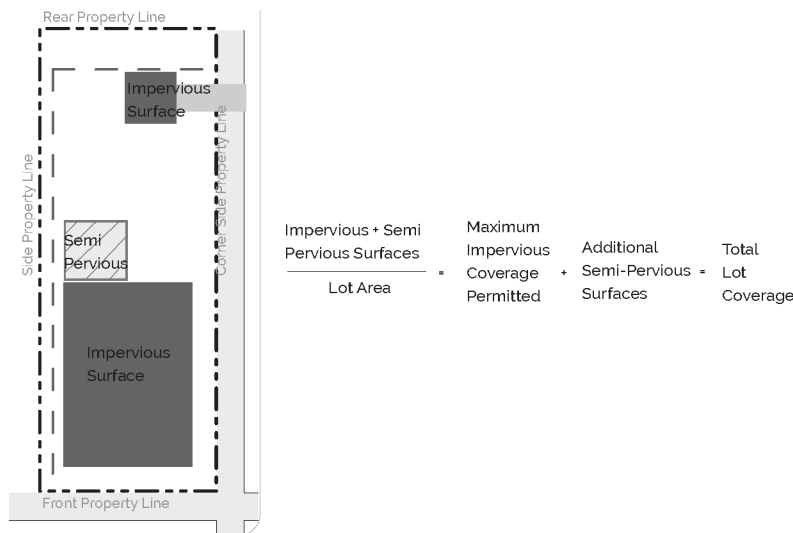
Building Siting, Street Frontage, Lot Area and Front Lot Line Coverage
